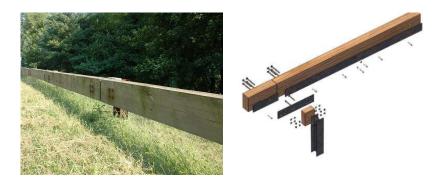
Merritt Parkway Guide Rail/Steel-Backed Timber Rail
